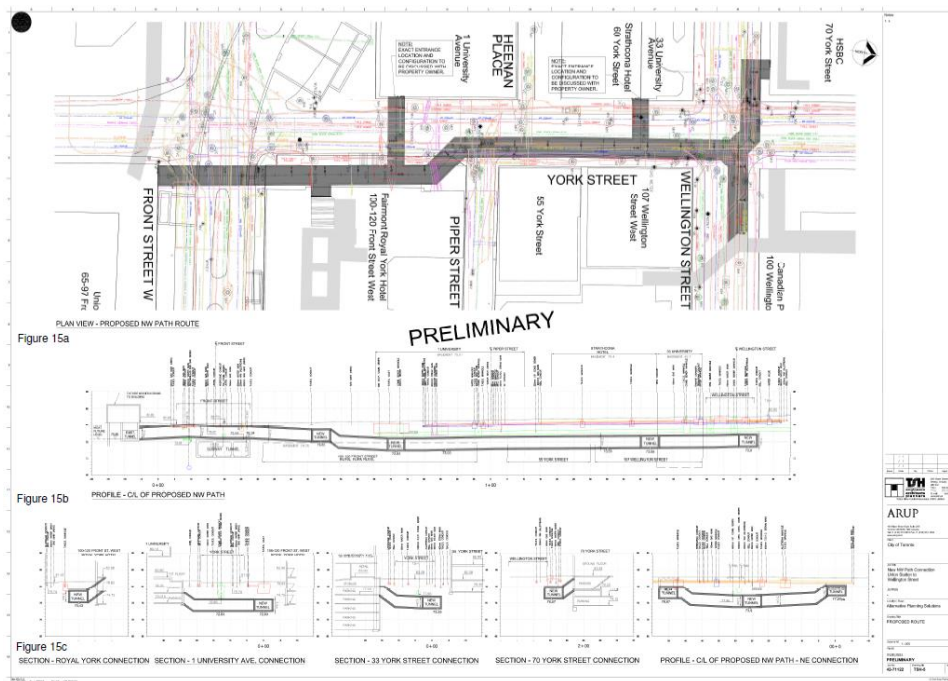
2008 EA approved preliminary underground York tunnel drawings
